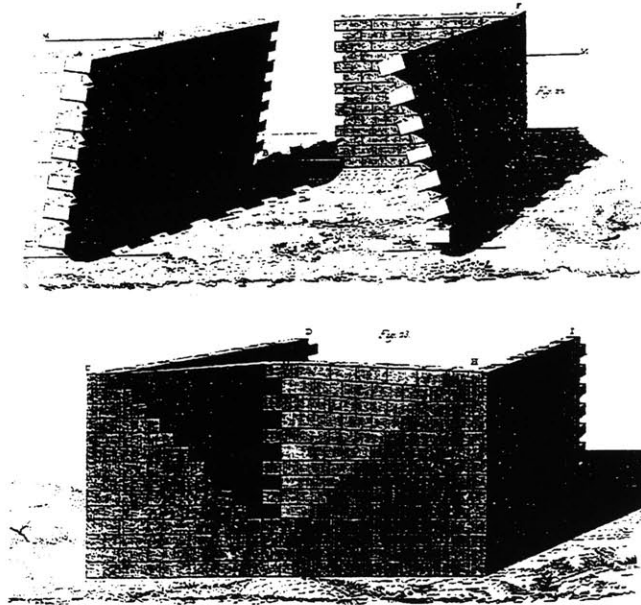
Failure modes of a masonry wall according to Rondelet.
